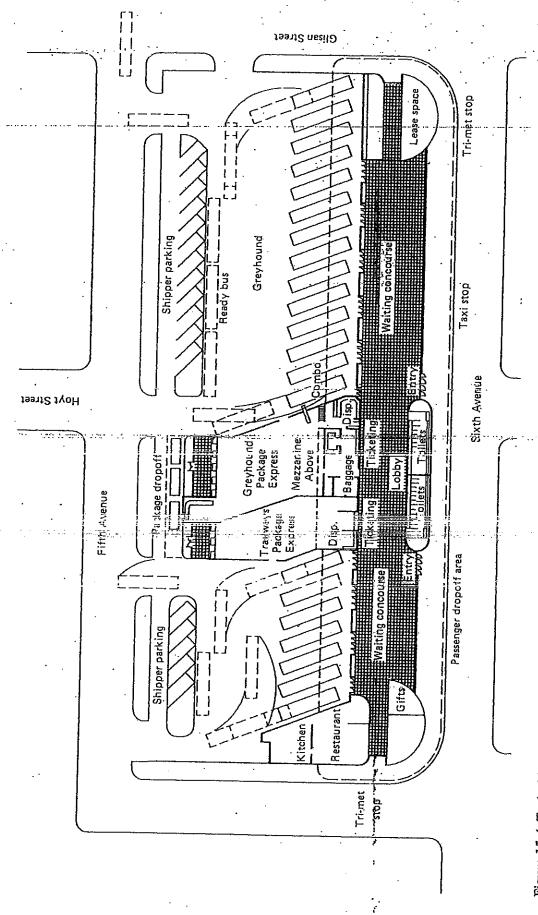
Typical layout of bus transportation center. (Courtes., Trailways Bus System.)
